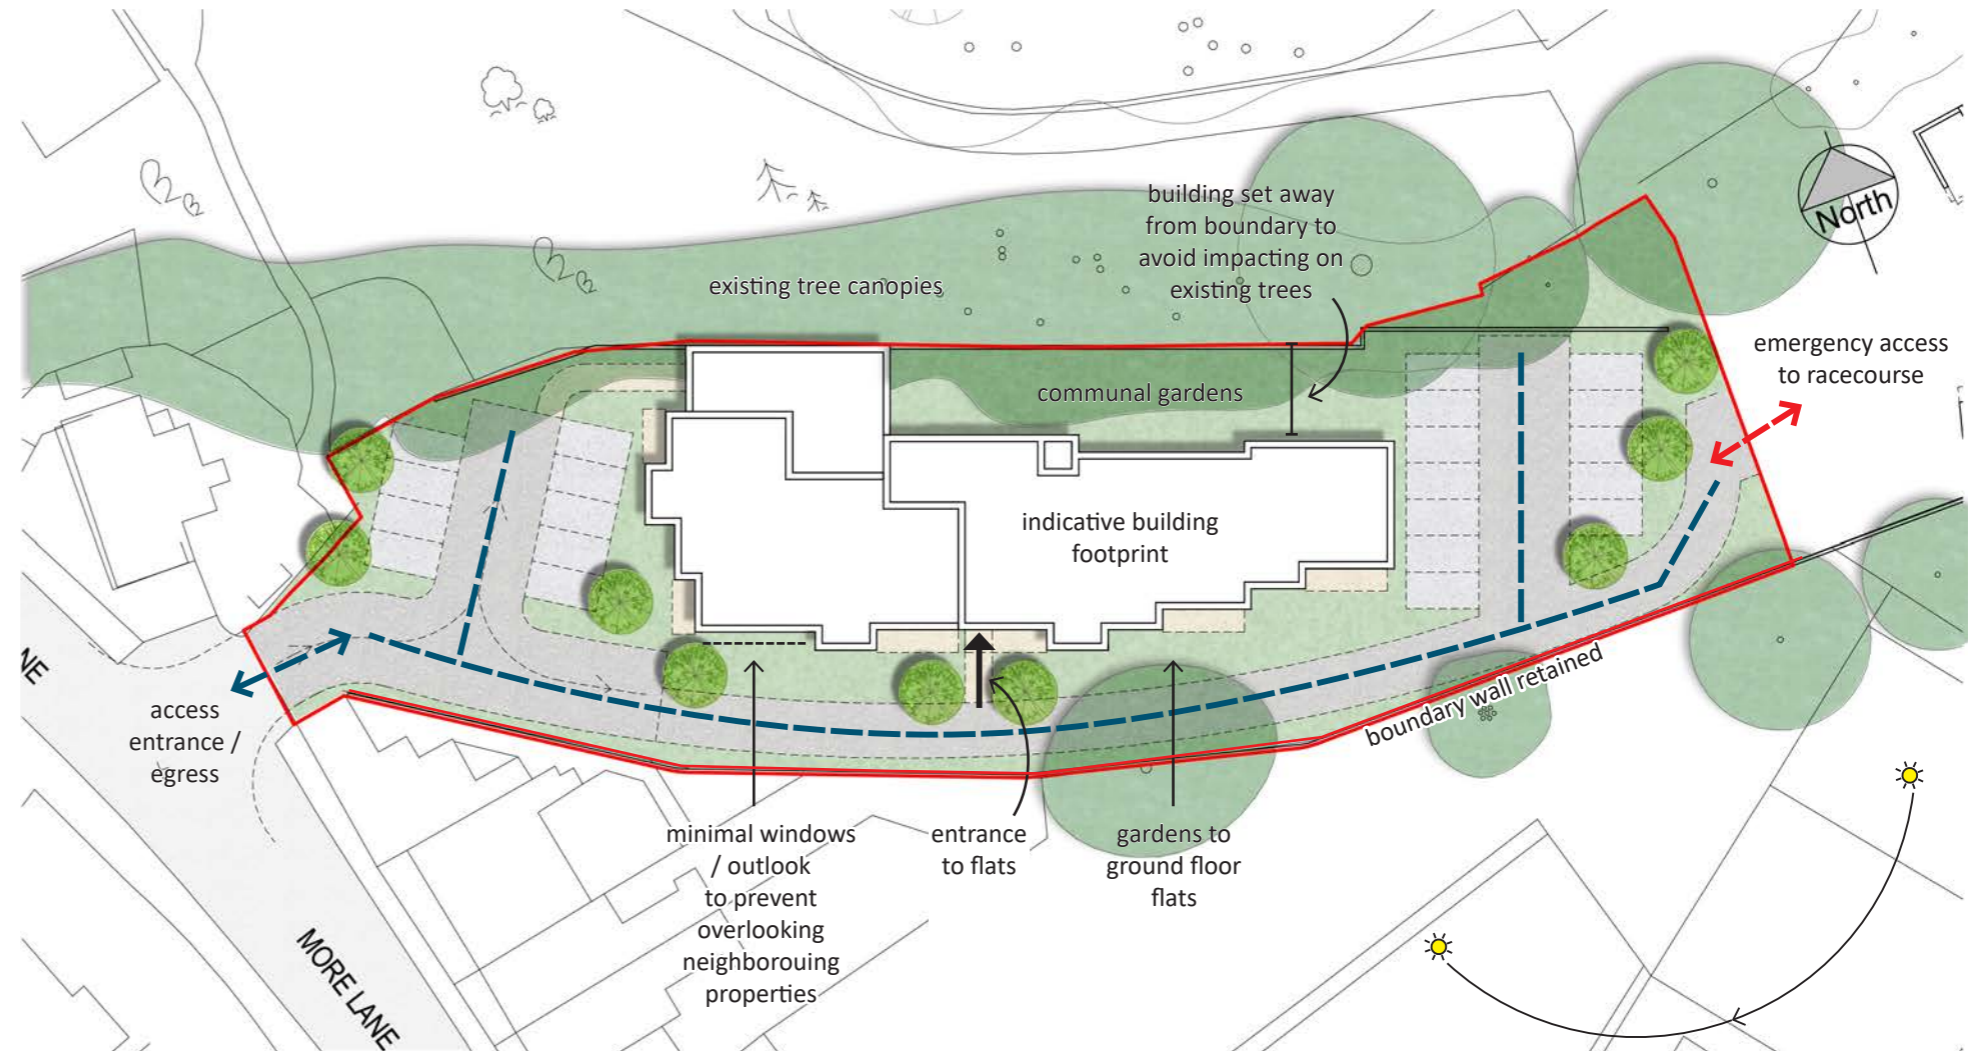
Illustrative Layout for Site 1 - Mews Residential
